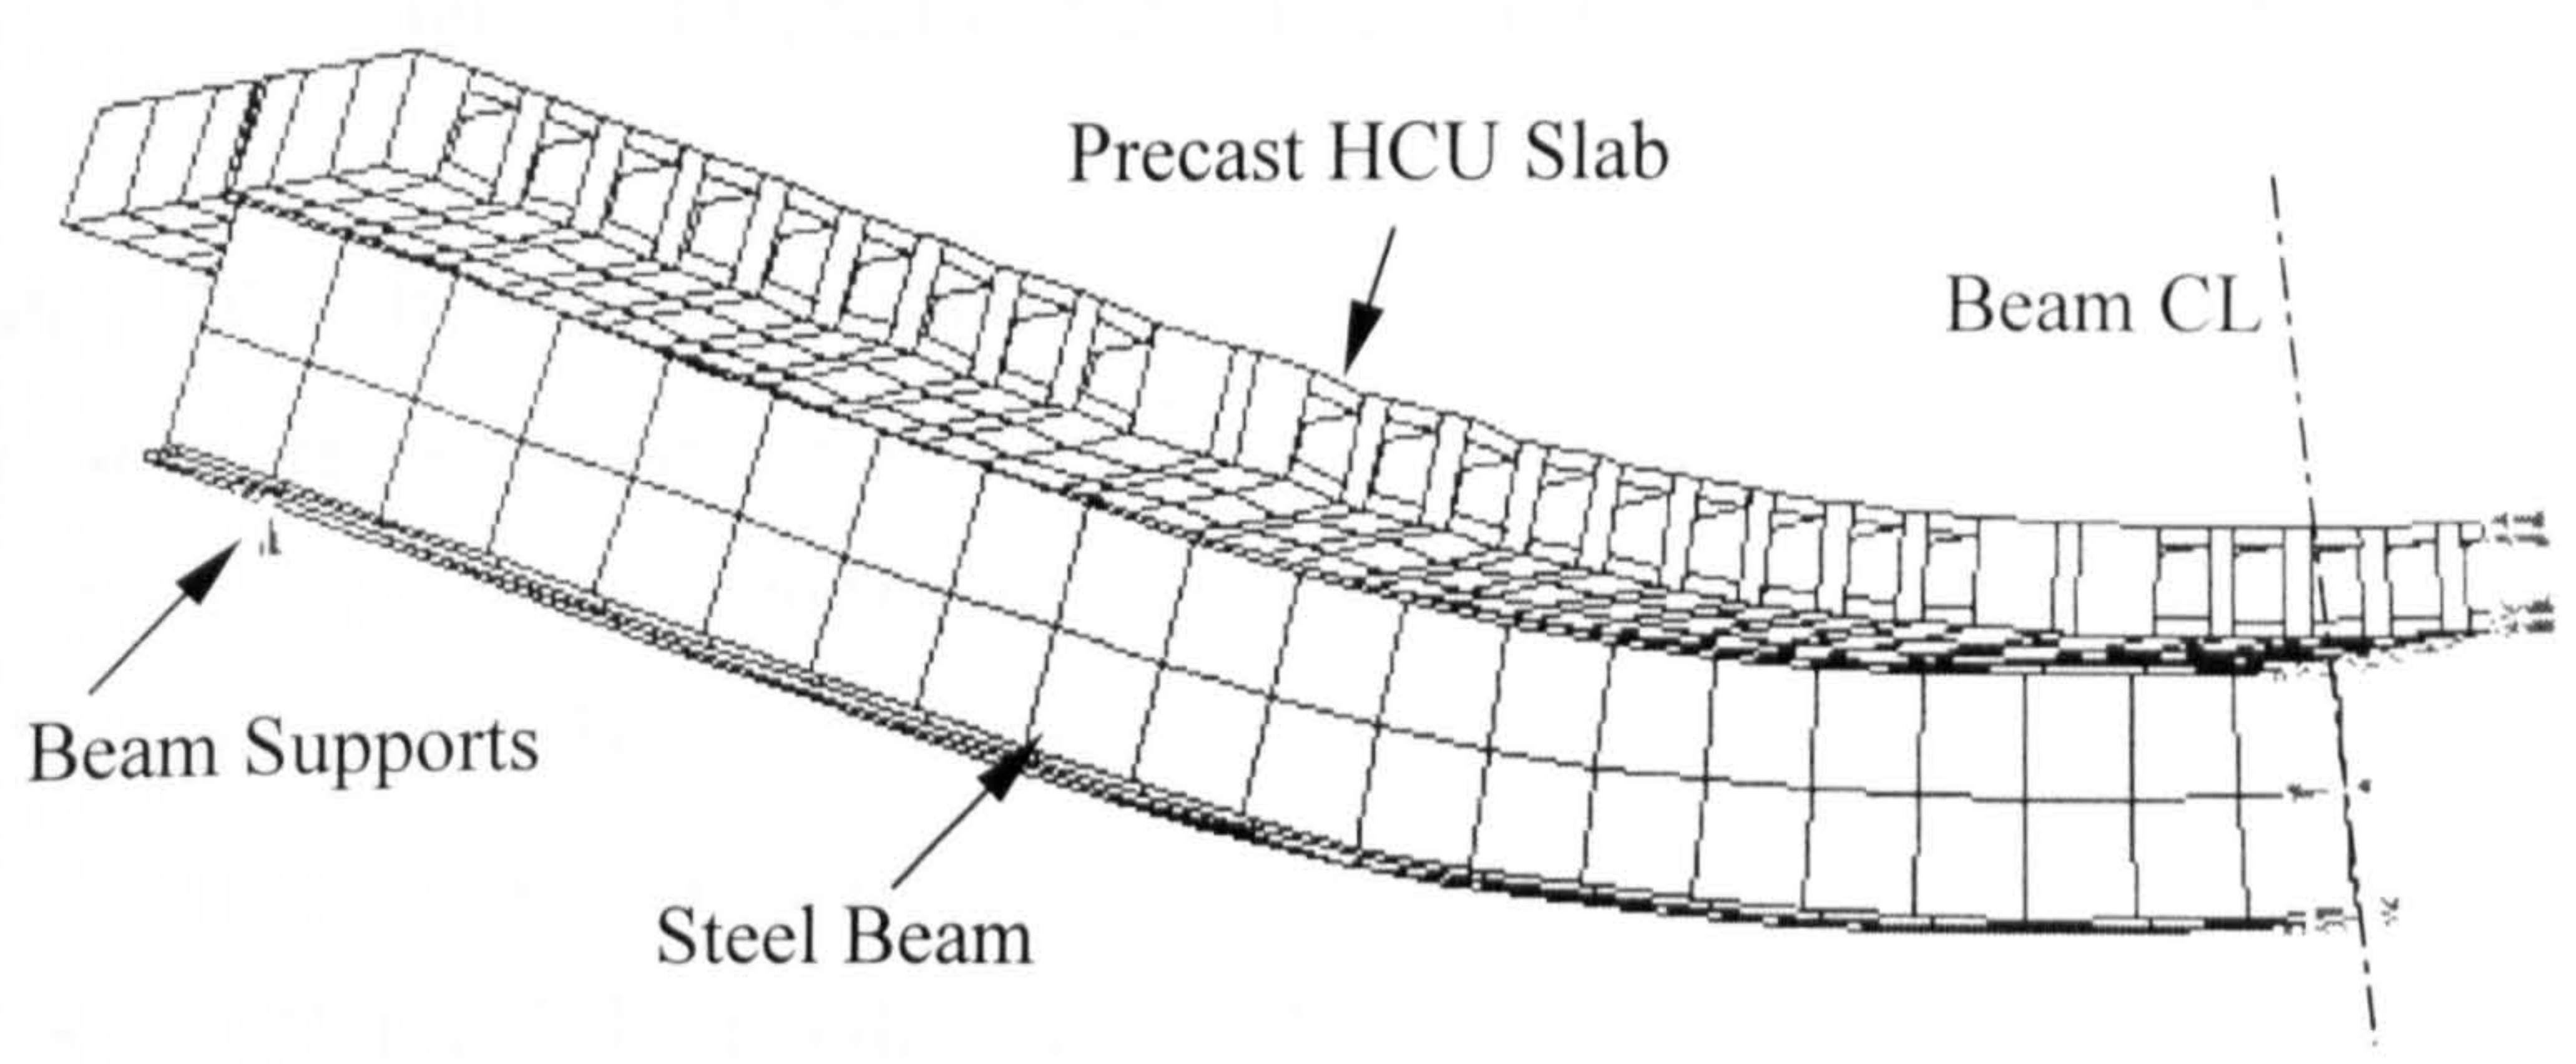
Displaced shape of composite girder B3 at failure
